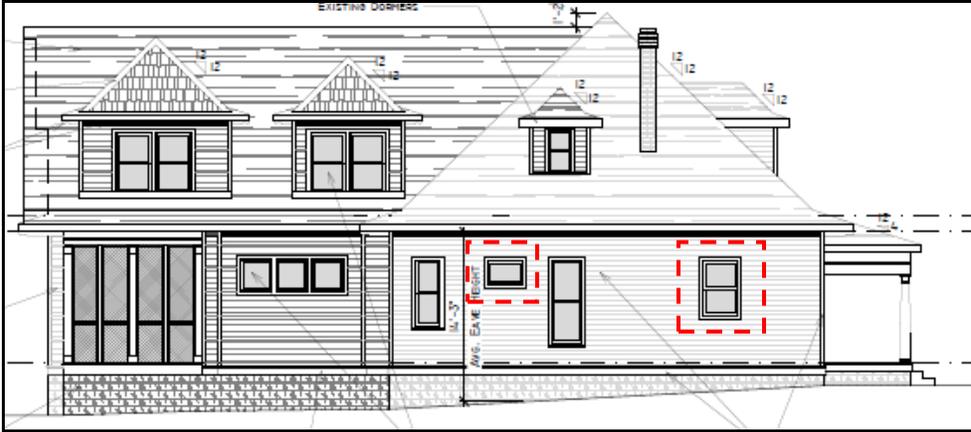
East elevation. The two openings proposed for alteration have been indicated.
